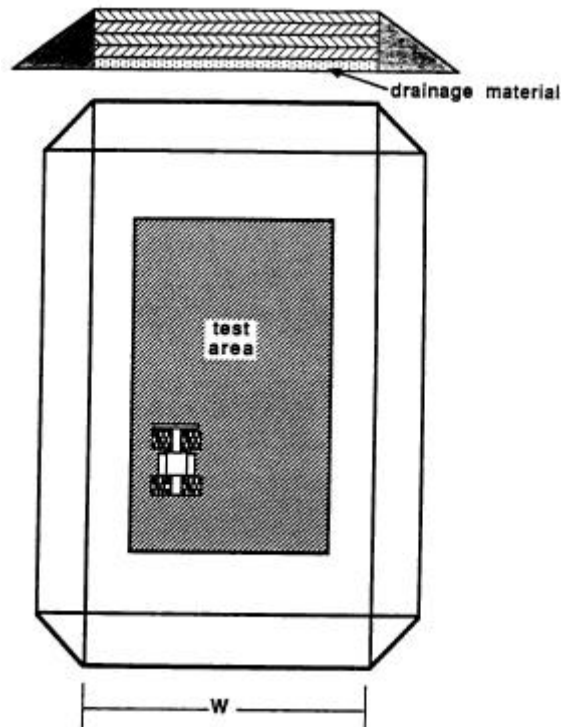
Typical Layout of a Compacted Soil Liner Test Pad.
